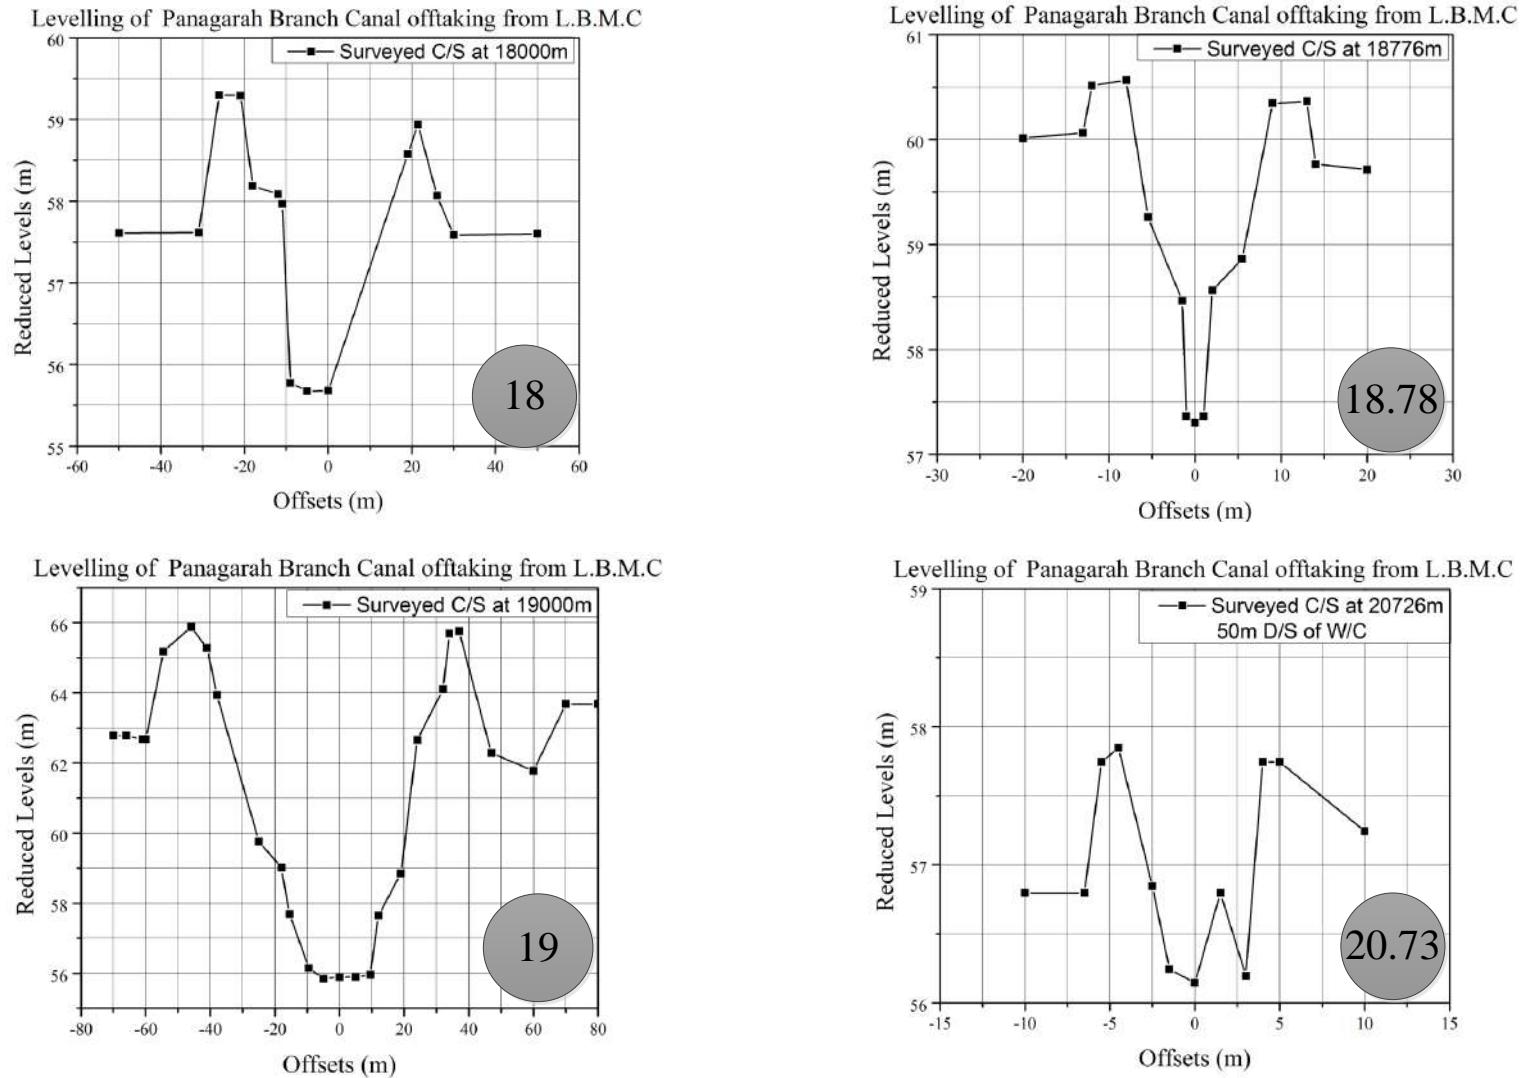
Canal cross section from 18 km to 20.73 km on Panagarah branch canal
